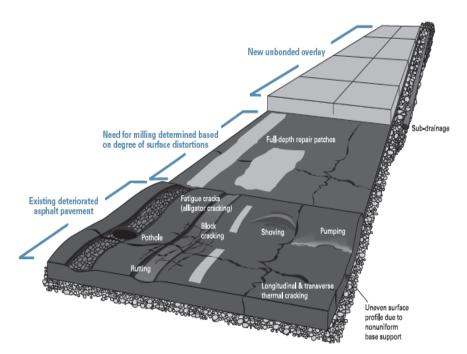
Notable distress on existing pavement and possible repairs for thick whitetoppings [4]
